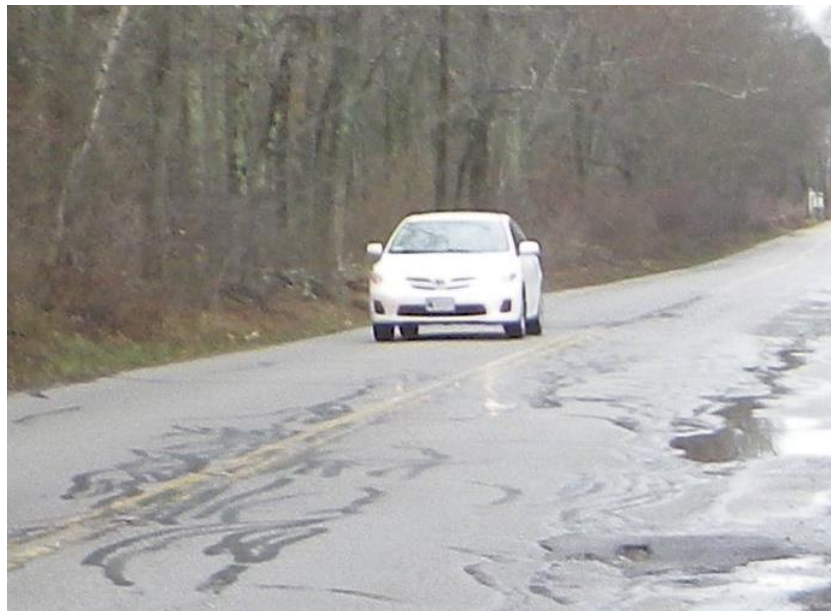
Vehicle traveling northbound on Old North Road. Note the elevation of the driver's eyes in relation to the top of the stone wall.
